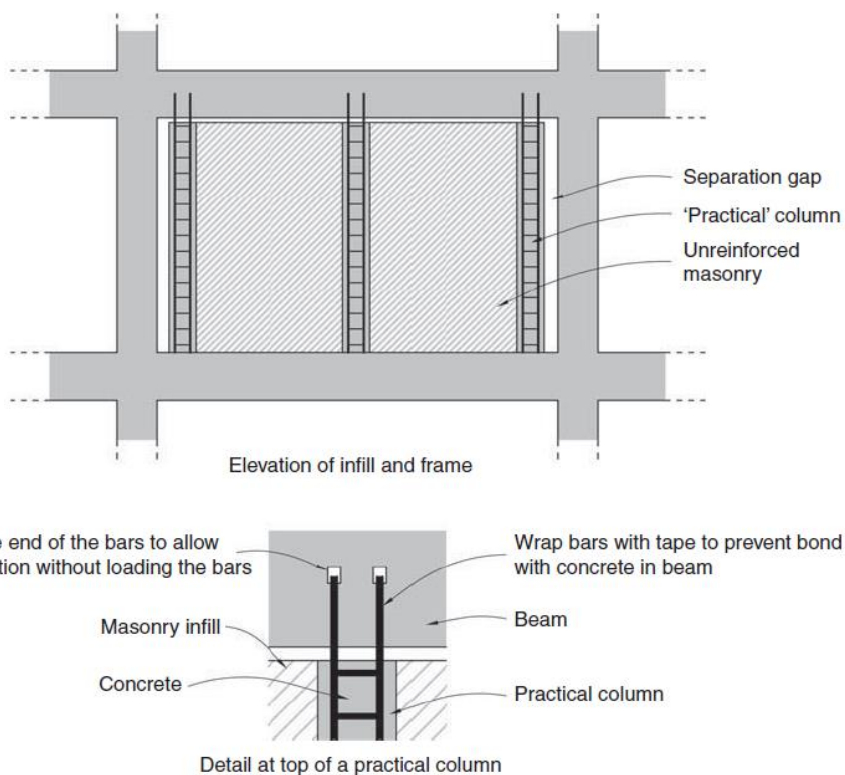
Two possible structural details that resist out-of-plane forces yet allow relative movement between an infill wall and structure above.
